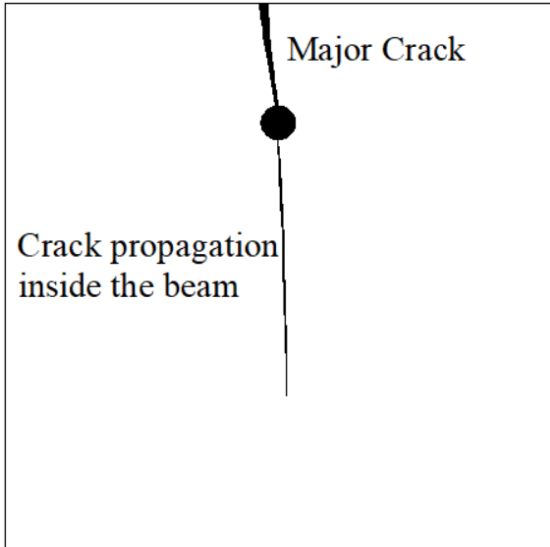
Propagation of Cracks inside the Beam (C = 37.5 mm)
